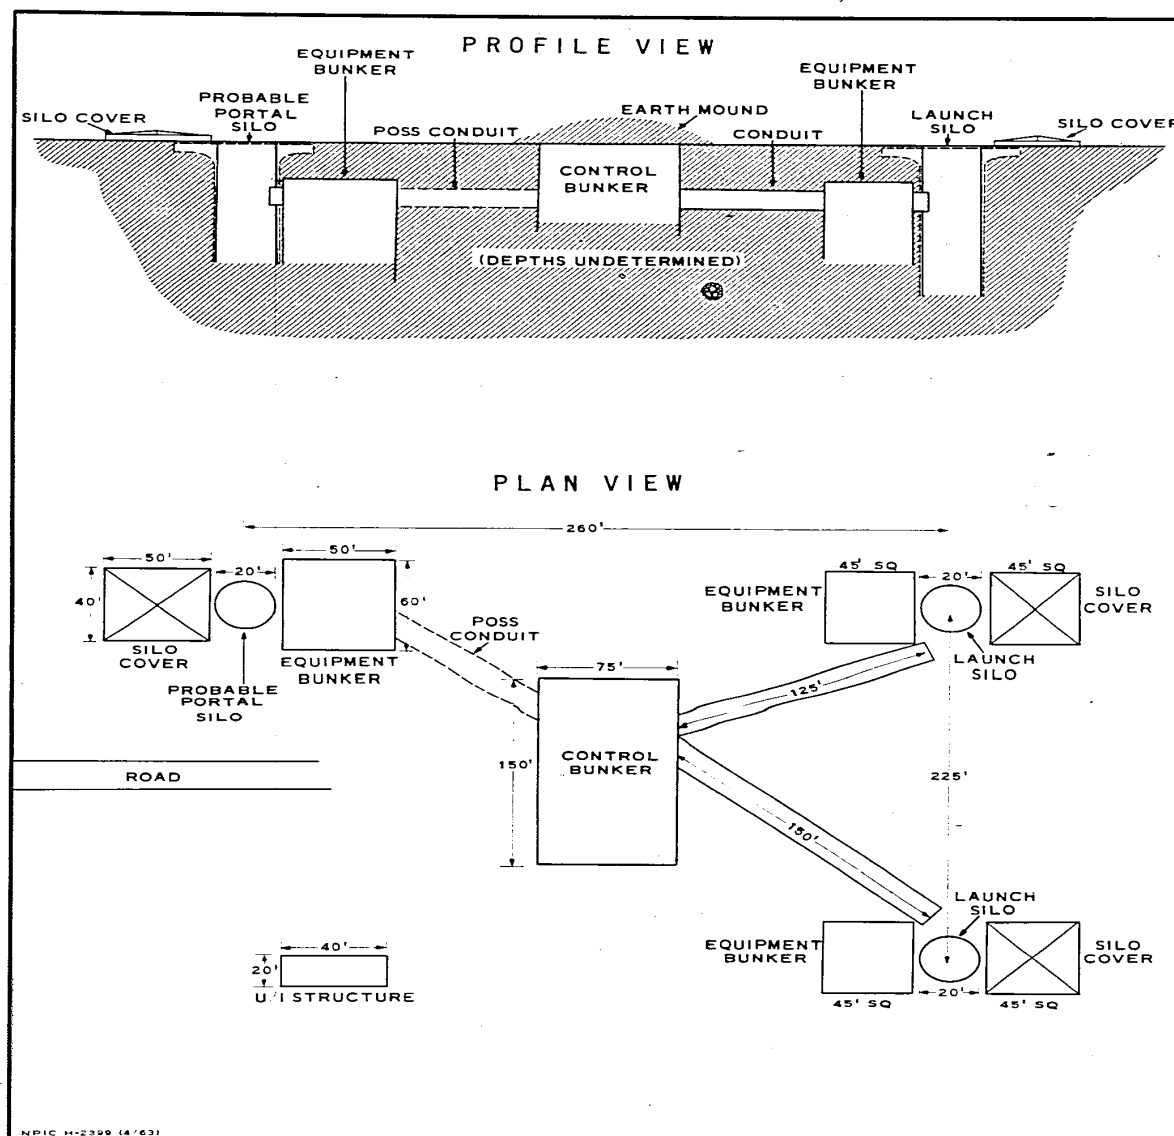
PROFILE AND PLAN VIEWS OF A HARDENED MRBM IRBM AND IRBM LAUNCH AREA.
